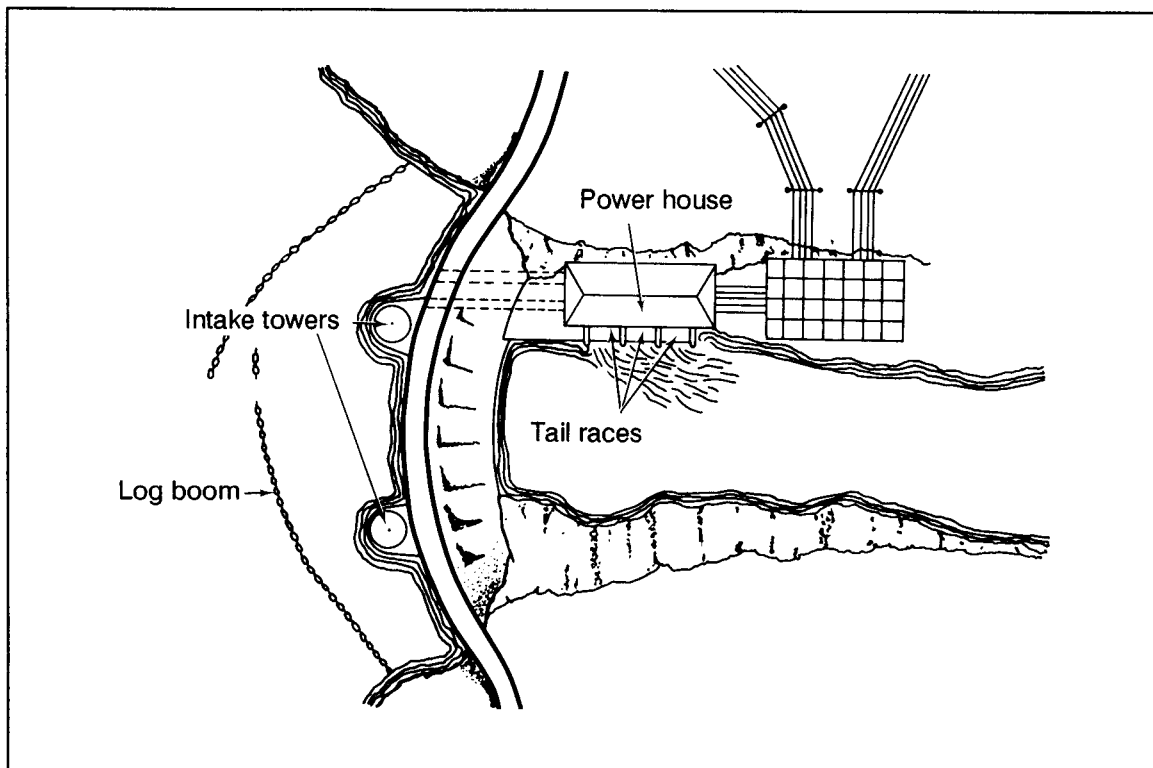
Example of construction/building type (high dam type hydroelectric power plant system)
